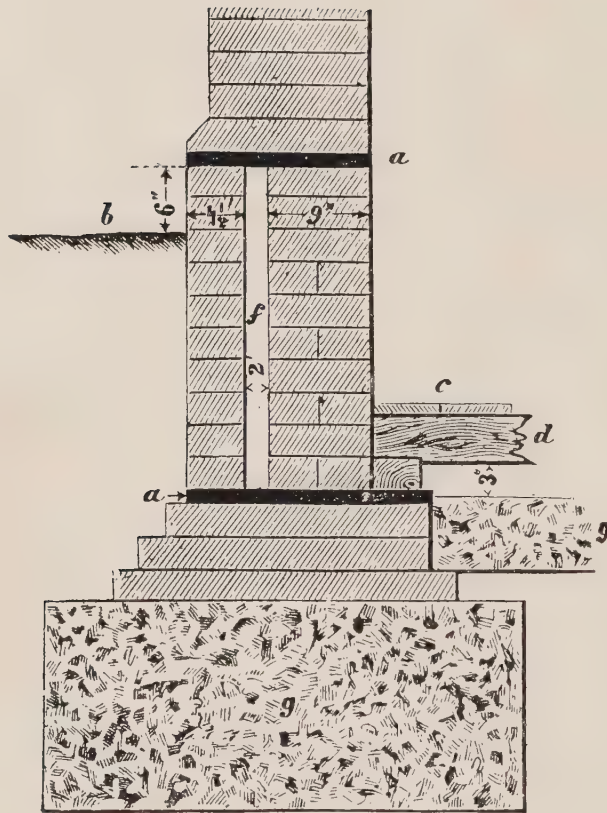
Position of damp-proof courses *a, a*, in wall of a building erected below level of adjoining ground ; *g, g*, layers of concrete ; *f*, dry area.
